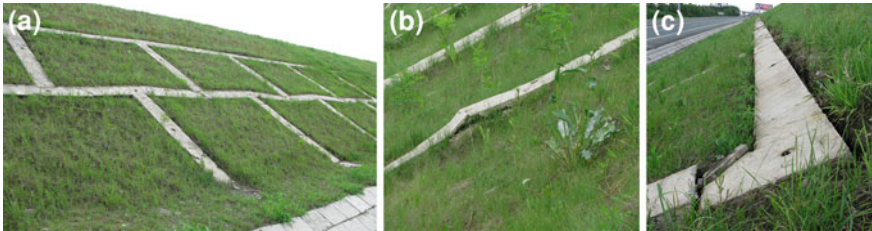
Highway slope protected by steel-concrete frame. Failure occurred in the structures
